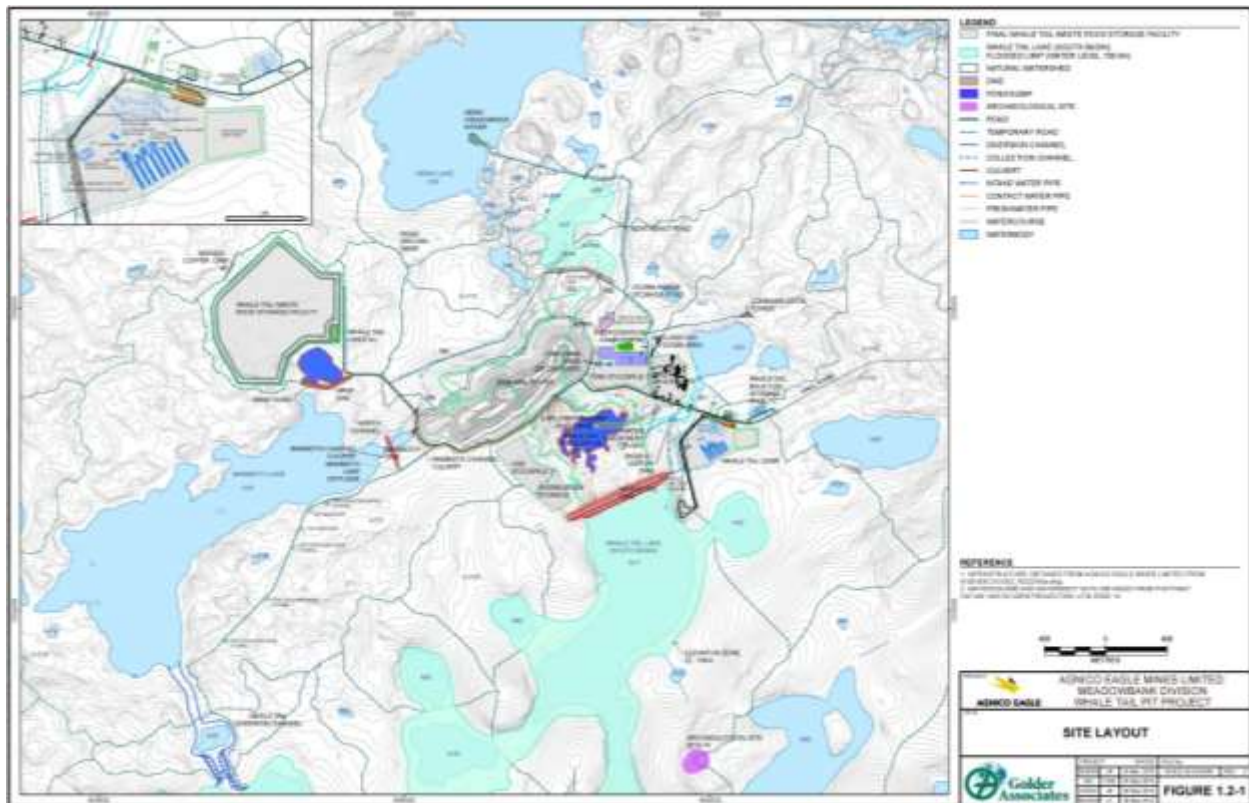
Whale Tail Site Layout (from the *Whale Tail Pit Project Proposal Description, Volume 1*)
